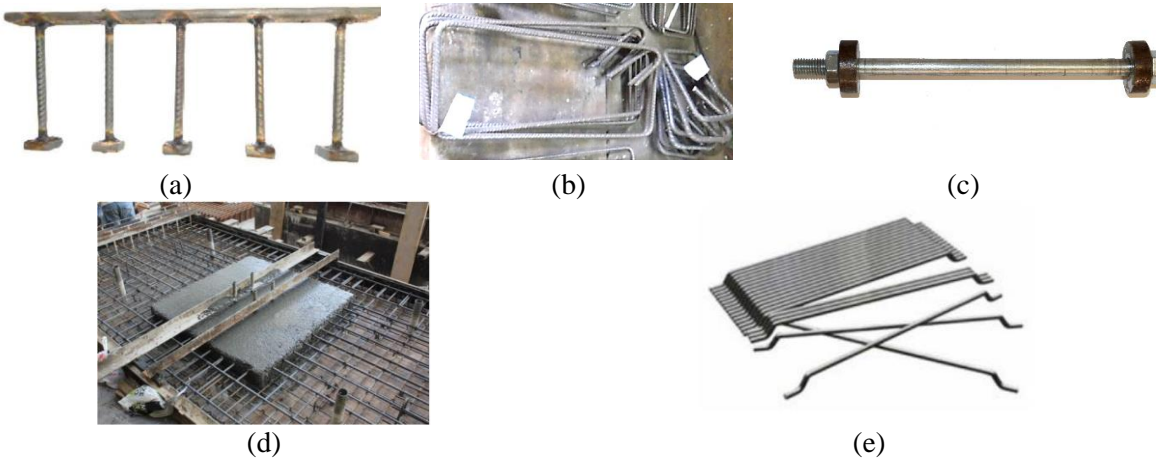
Punching shear enhancement methods tested: a) headed studs; b) stirrups; c) post-installed bolts; d) High strength concrete in vicinity of the column; e) steel fibers.
